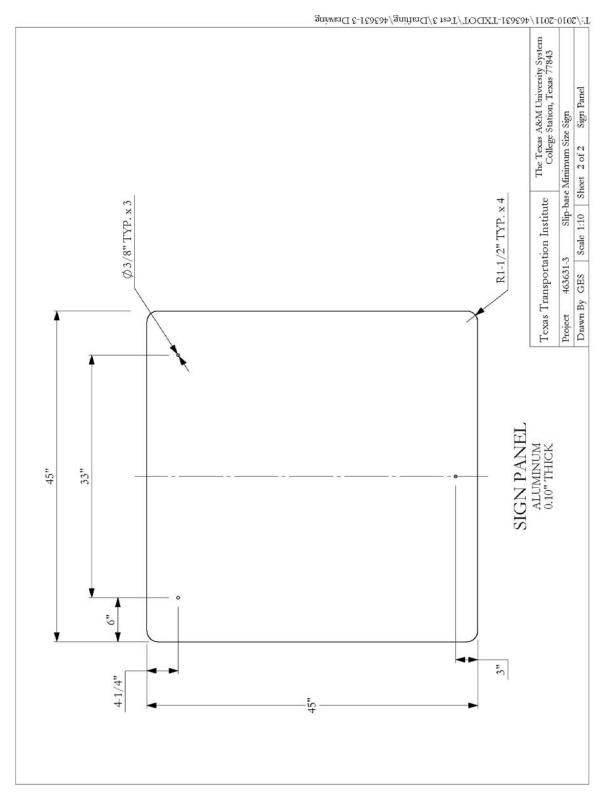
Details of the Sign Panel Used for Test No. 463631-3.
